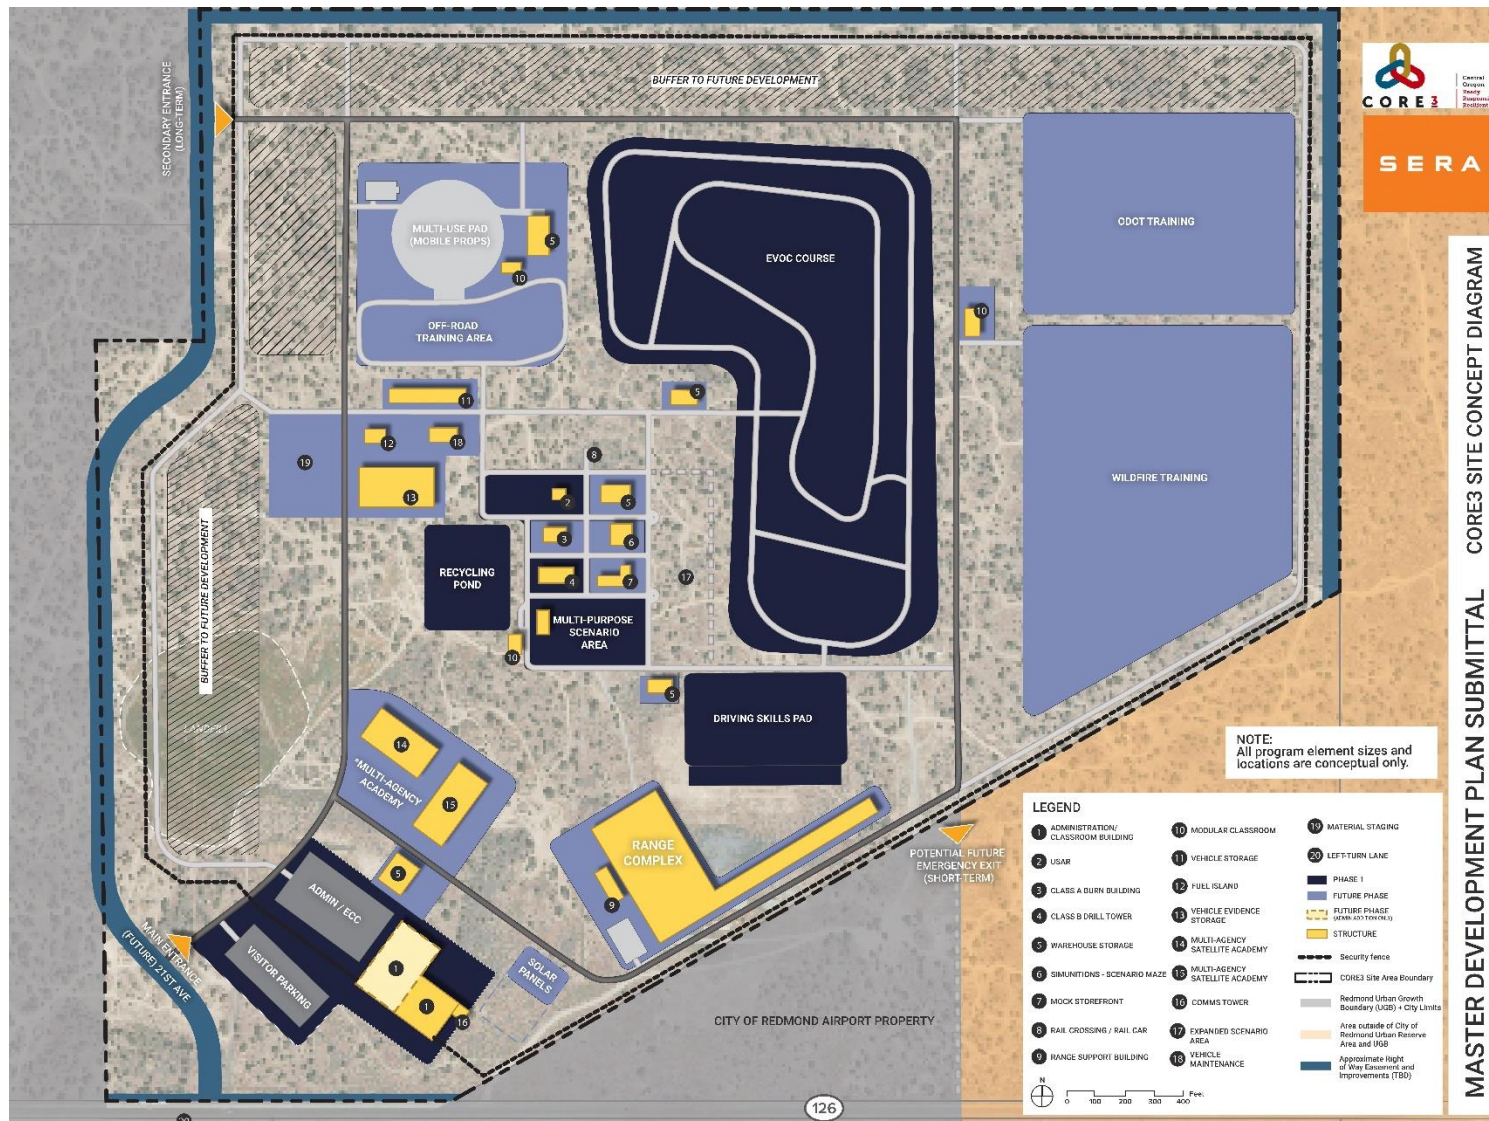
Master Plan Site Plan (Phase 1 shown with dark blue outline)
